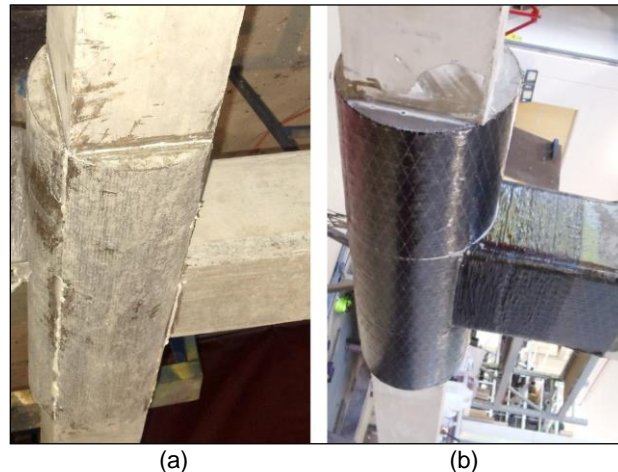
(a) Modified column section from square to circle by adding concrete cover. (b) CFRP confinement around the circle section of column (Hadi and Tran, 2016)
